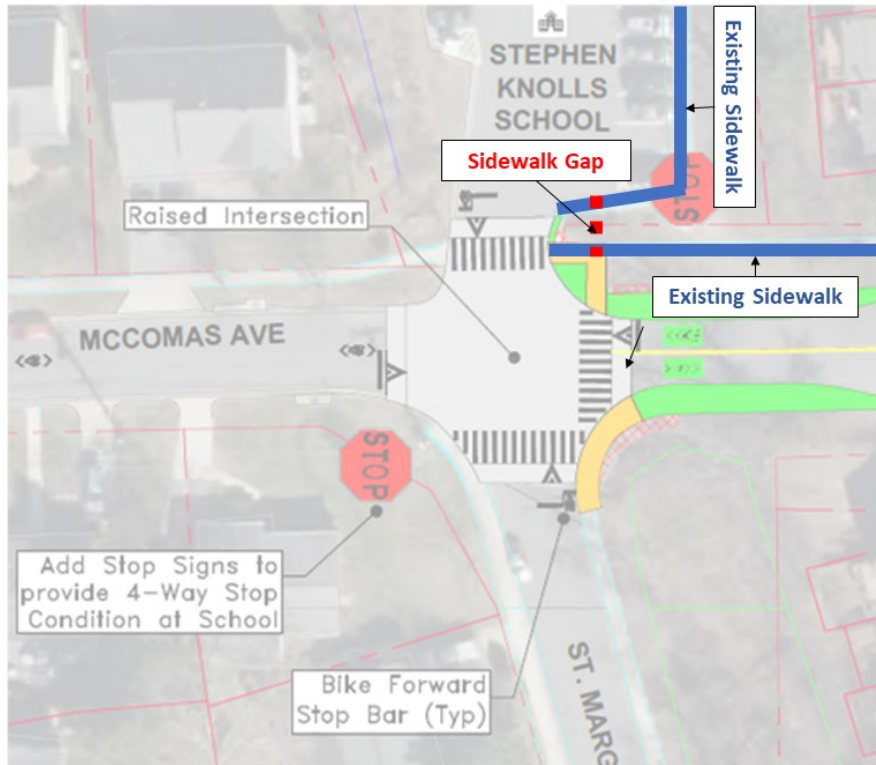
Overlay of the location of the remaining sidewalk gap on the project concept plans.
